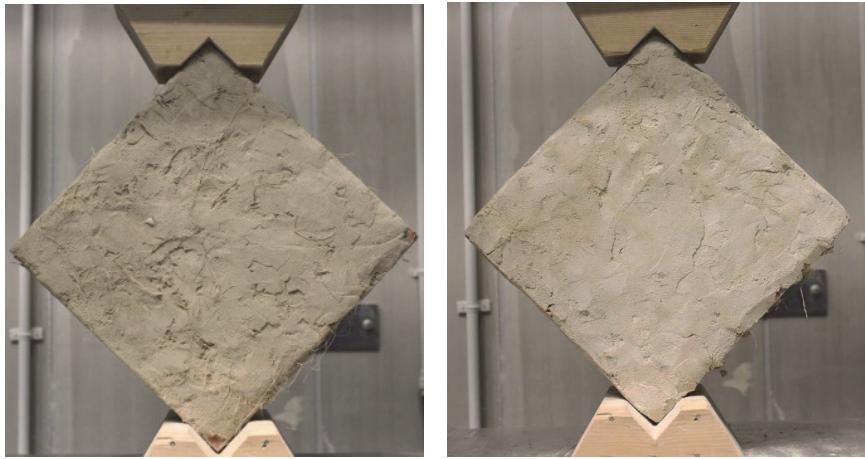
Testing of in-plane specimens, FRM (left) and ARM (right)
